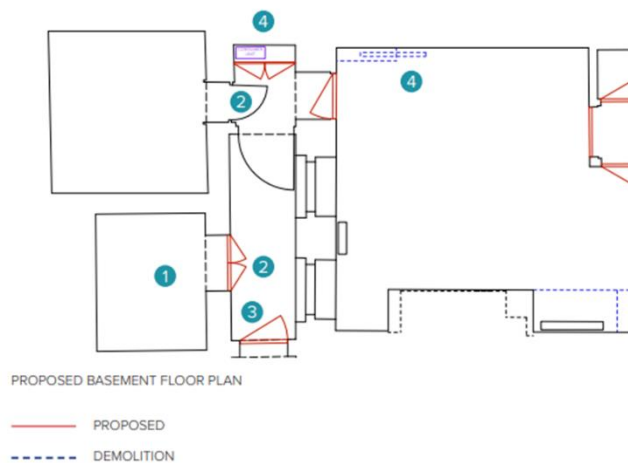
Proposed Basement Floor Plan (Archer and Braun Architecture)
